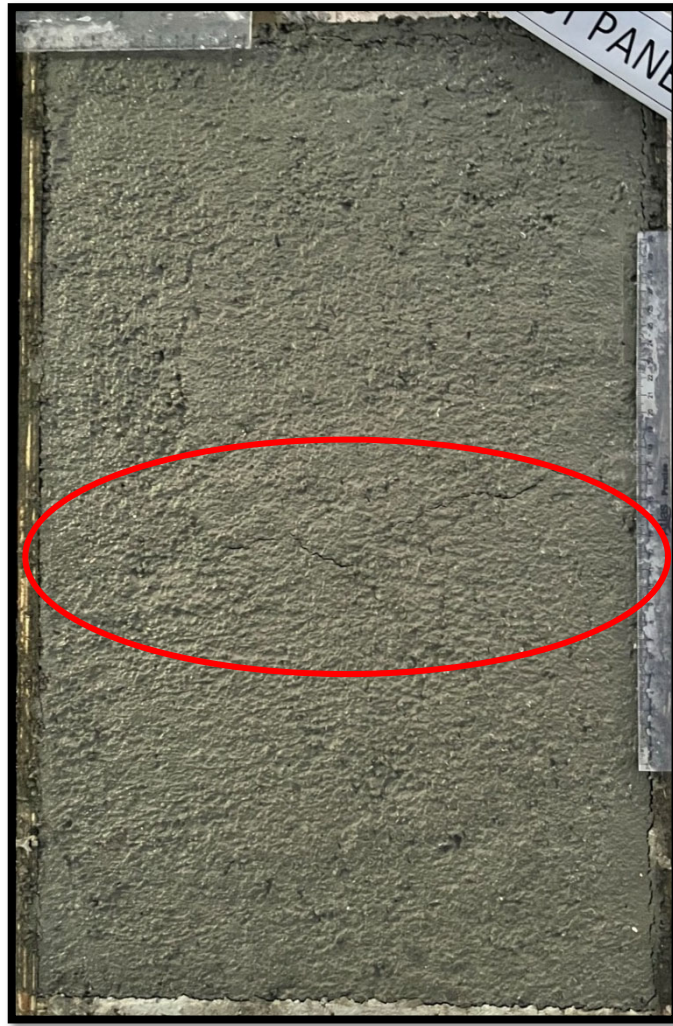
Crack pattern of the concrete mix of fresh concrete temp. 34.2 °C
